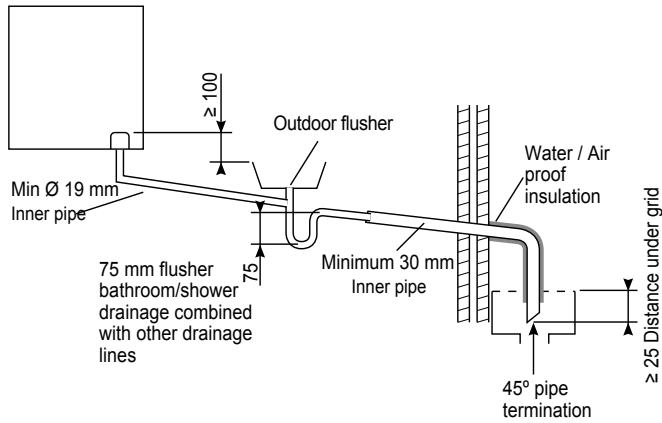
Connection of Condensate Drainage to Rain Drainage Line through Sink, Bathtub or Shower Drainage Pipe
